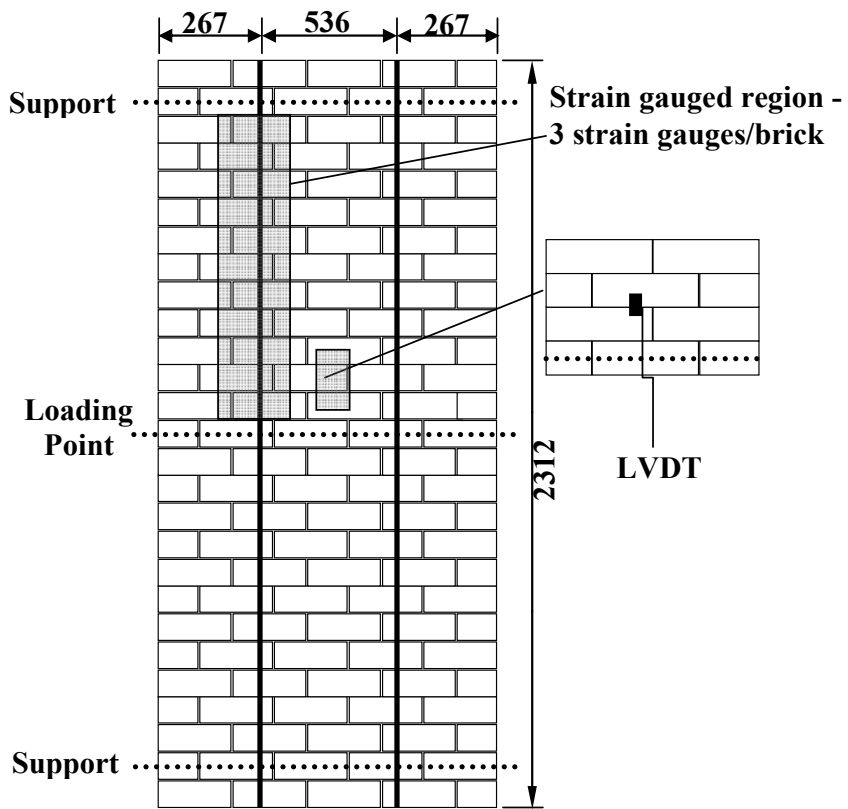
Instrumentation for walls reinforced with three strips (walls 7, 8)
